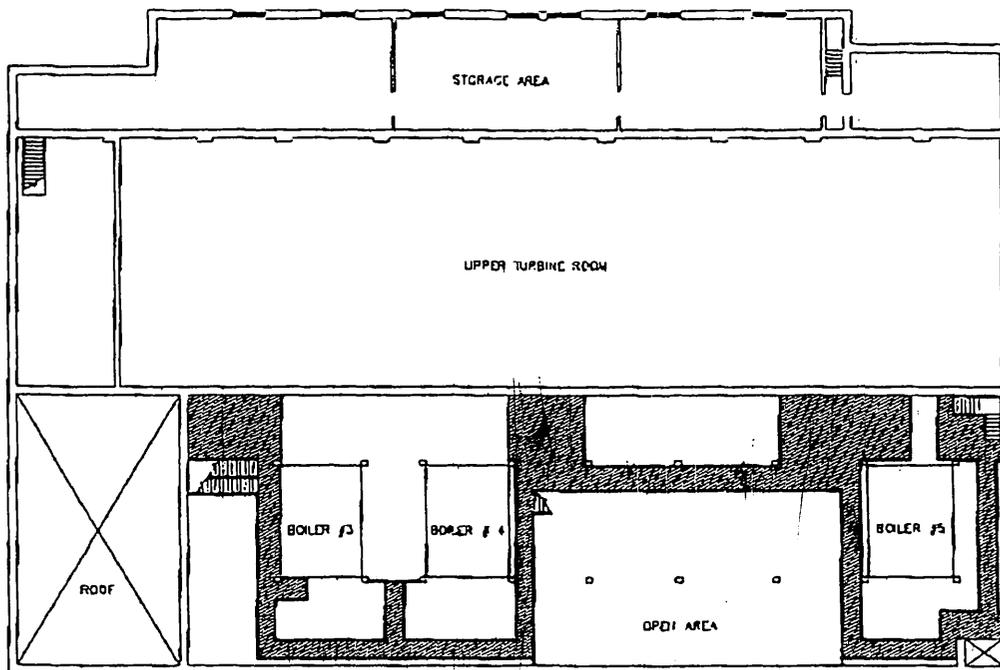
Third floor plan, Fremont Municipal Power Plant and Pumping Station.
